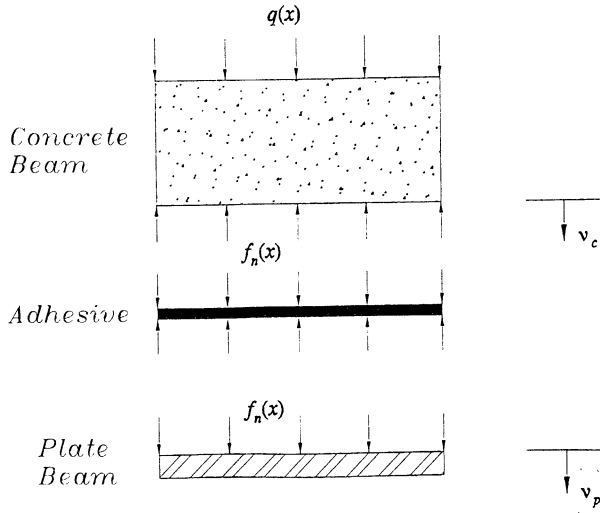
Normal stresses acting on the isolated concrete and plate beams
